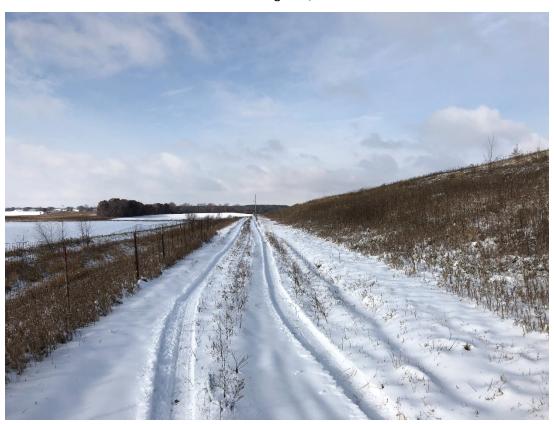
Location 8 – Looking West, Phase 2 Southern Perimeter Road and Slope
